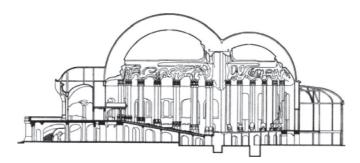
Section of the first Goetheanum. Photo: © Rudolf Steiner Press, London. Source: Eloquent Concrete: How Rudolf Steiner Employed Reinforced Concrete, 1979, Transparent overlay illustration 44.
